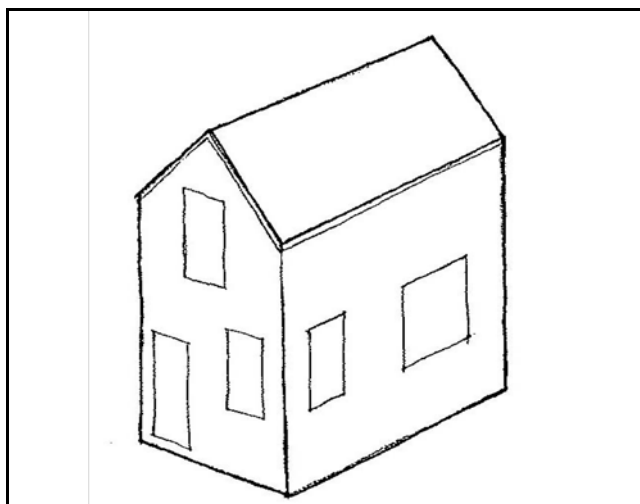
This early cottage has been given *form* by its rectangular plan, walls and gabled roof.
